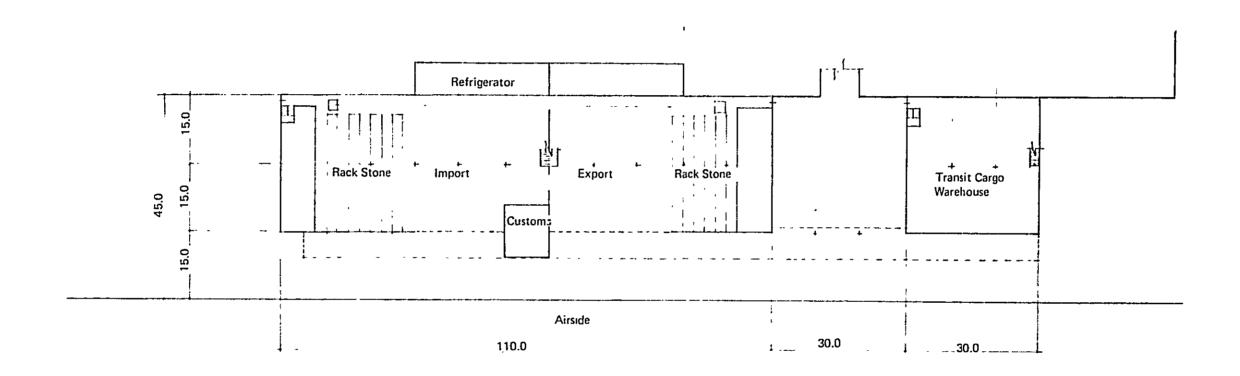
Proposed Cargo Terminal Bldg. 1st Floor Plan
